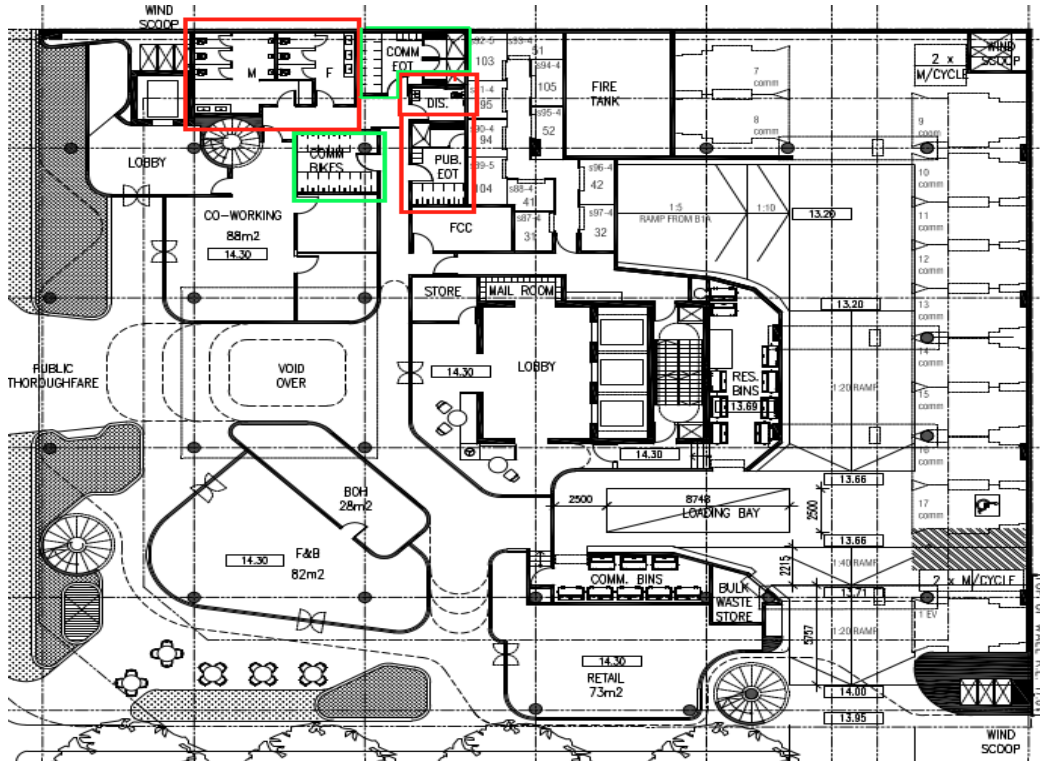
Previous ground floor plan as part of previous RAR with public facilities comprising 3 male and 3 female toilets, 1 universal toilet and end of trip facilities comprising 1 shower, 3 lockers and 5 bicycle racks as marked in red, with the commercial end of trip facilities marked in green
